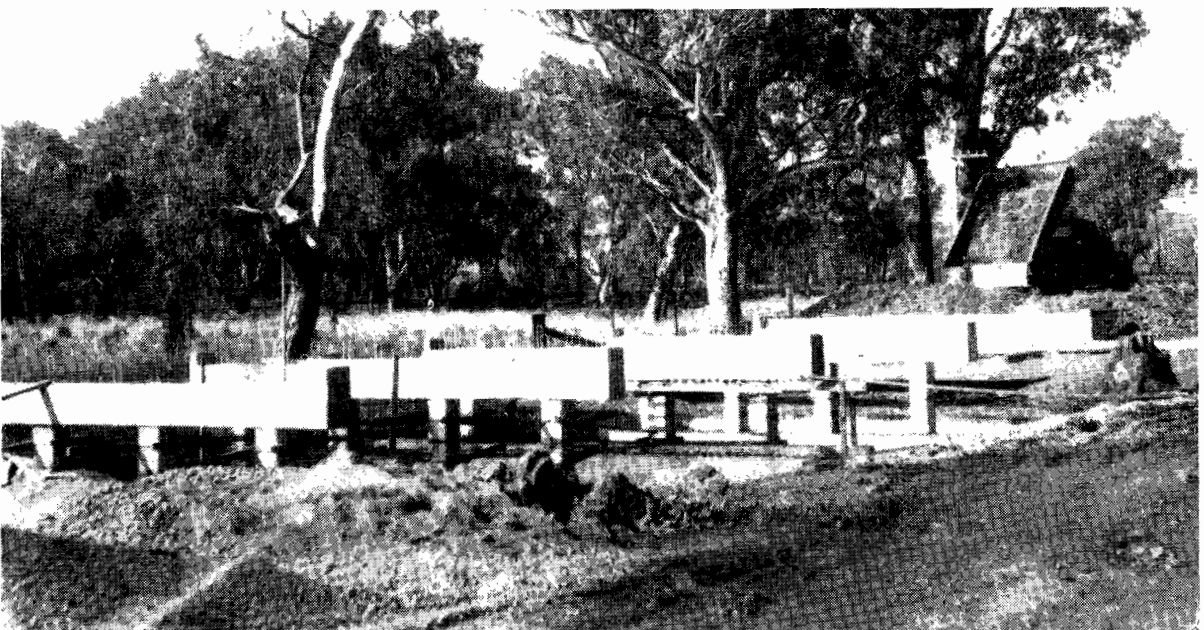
Shire of Yea. Piers at Ghin Ghin Bridge No. 2 on Ghin Ghin Road.
